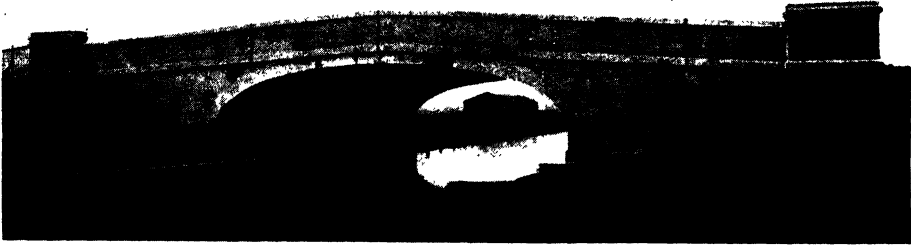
MOSS ROAD BRIDGE, STRETFORD.
